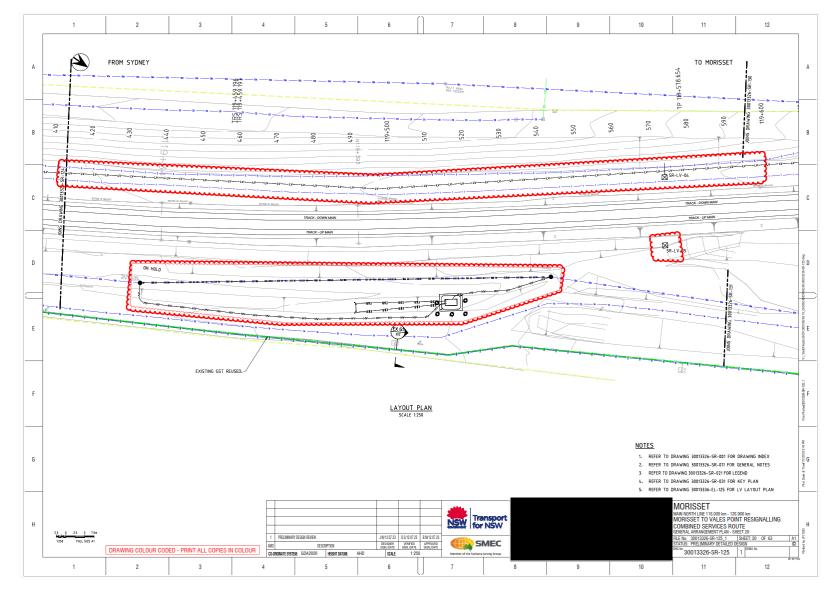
Proposed excavation works adjacent to Zone 2. Source: SMEC
